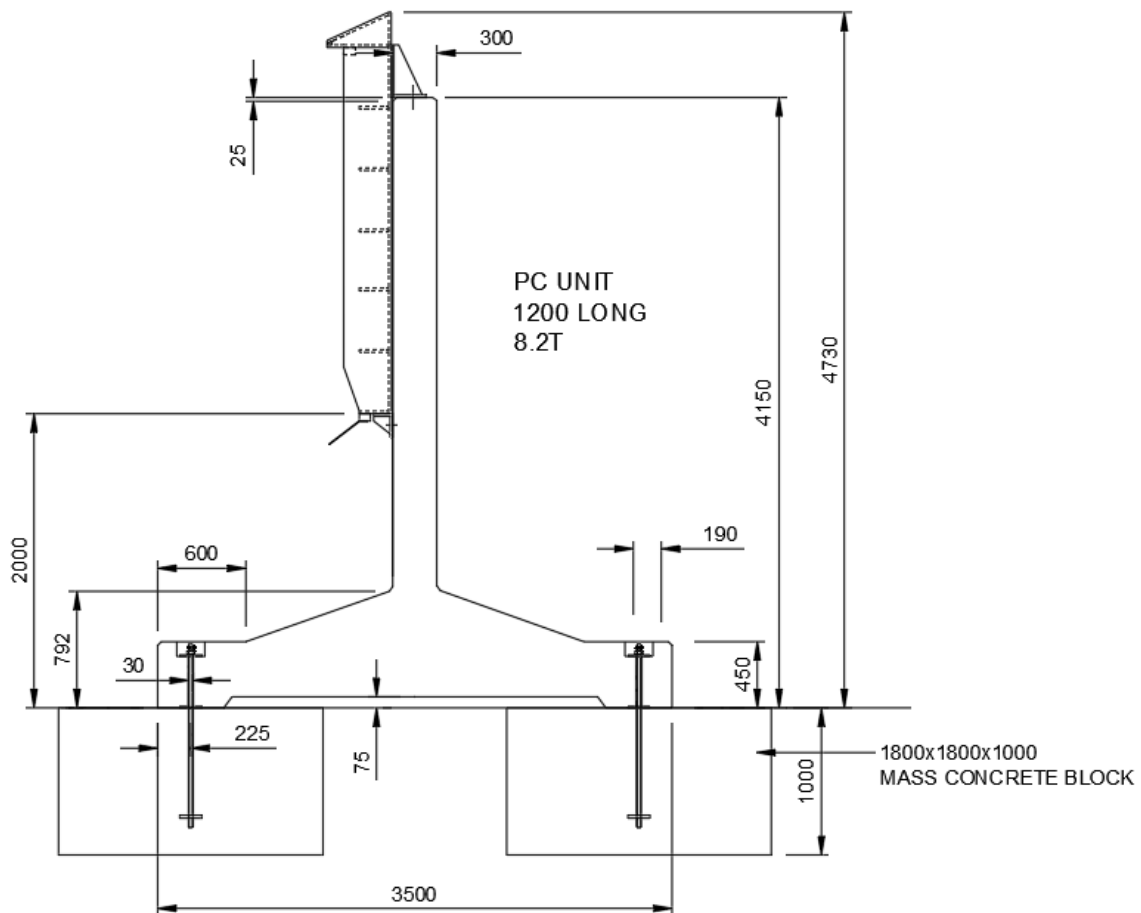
Wall Structure Precast Concrete Element cross-section, (Showing width of base (3.5m), height 4.73 (inc. 4.15 PC), six shelf structures for kittiwake to nest on and overhanging top to protect from weather and aerial predators.)
